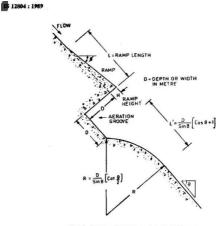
TYPICAL SECTION OF ABRATION GROOV
